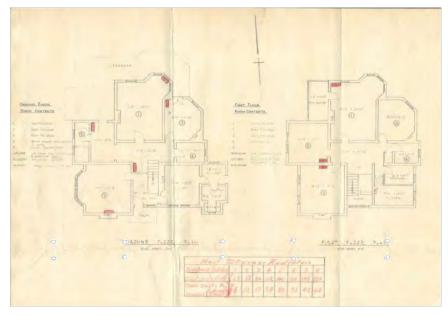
Floor plans, prior to additions to Gallery, Aigantighe Art Gallery Archive.
